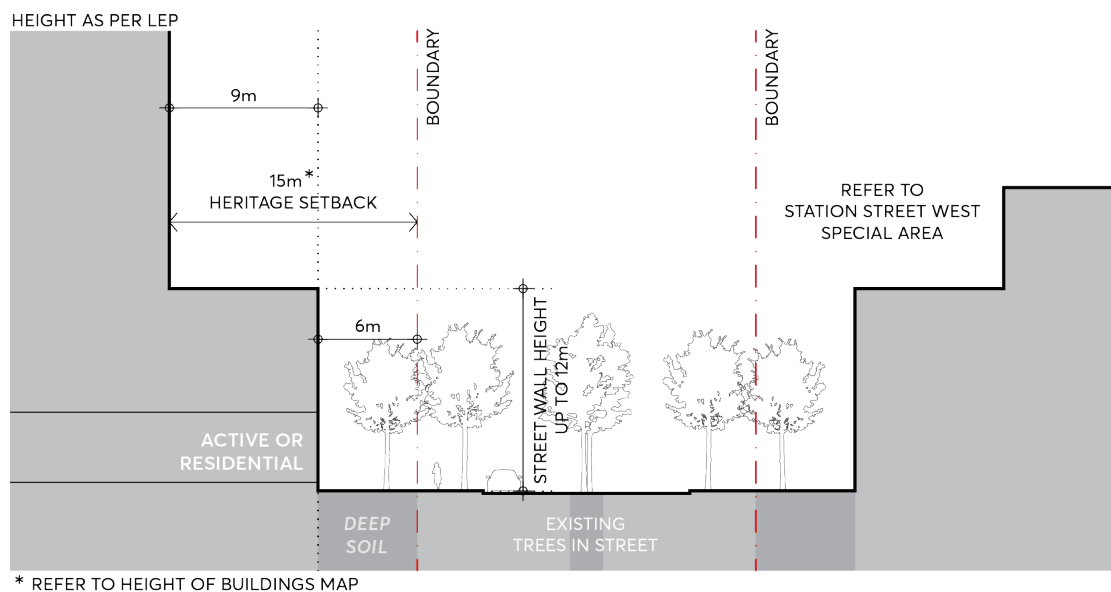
High Street (Section C) Setbacks and Street Wall Height
